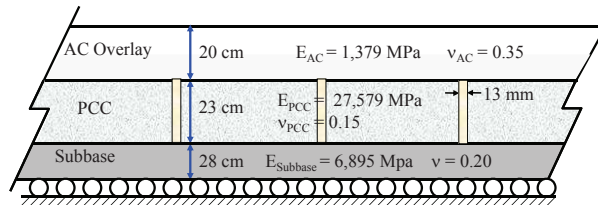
Material properties and details of a standard section of runway 4L-22R at O'Hare Airport.
